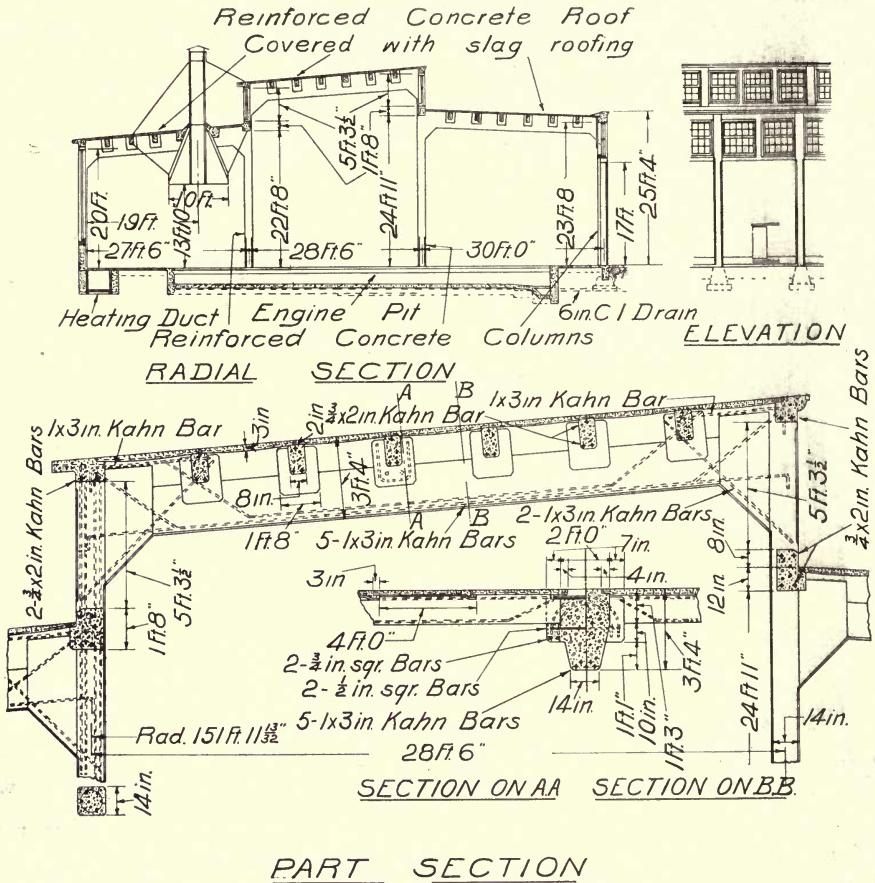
RADIAL SECTION WITH DETAILS OF ROOF CONSTRUCTION, WATERBURY ROUNDHOUSE.
